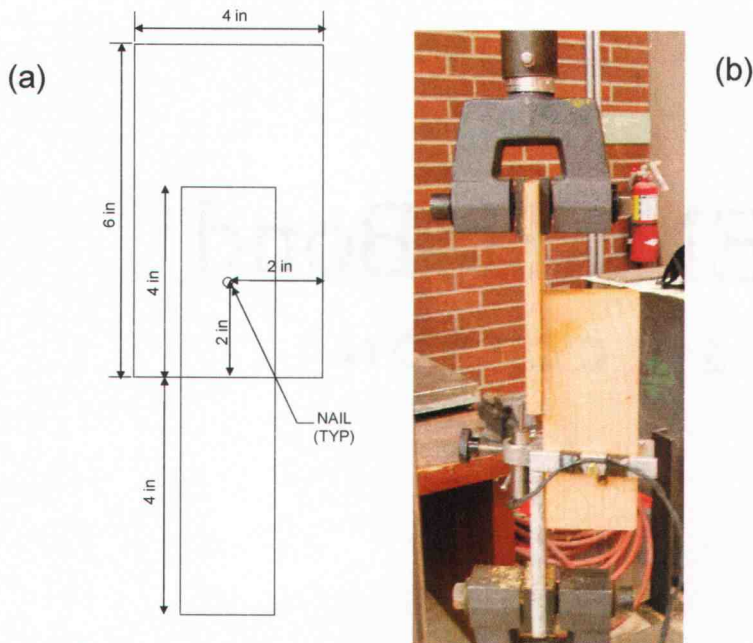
Single nail lateral connection test specimen (a) dimensions and detail, (b) test apparatus.
